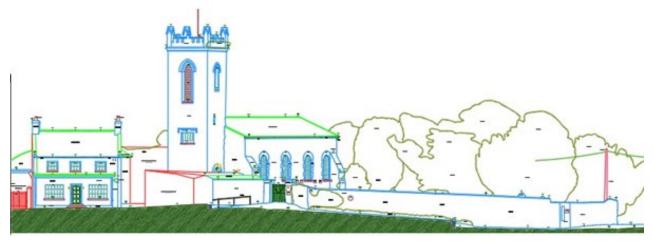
Measured survey drawings of contiguous West Elevation, showing Cashs' house and sheds at low level to the tower.
